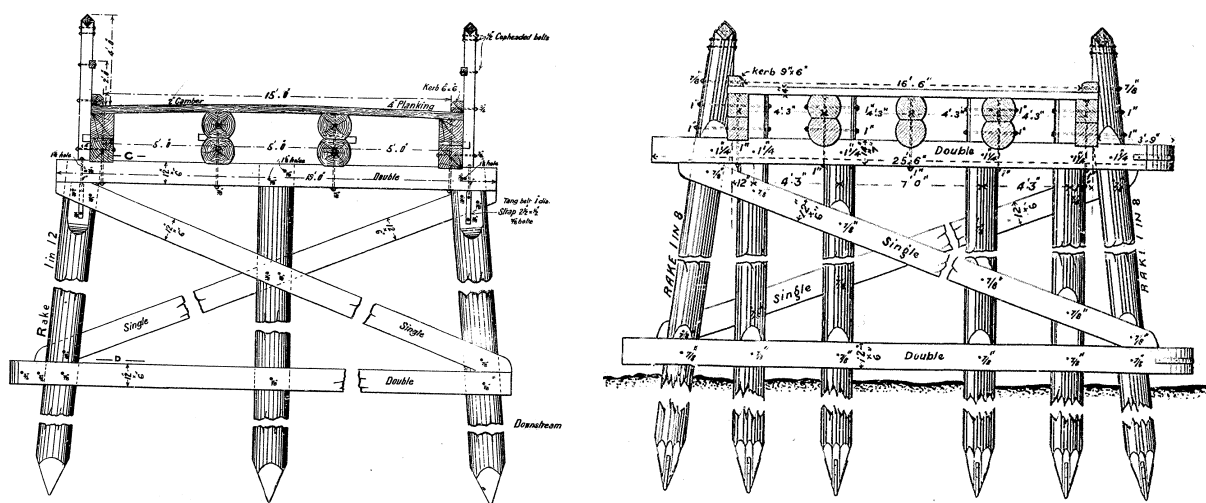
Post-1893 Plain Beam Bridges: high level (left) and low level showing extended piles (right)
